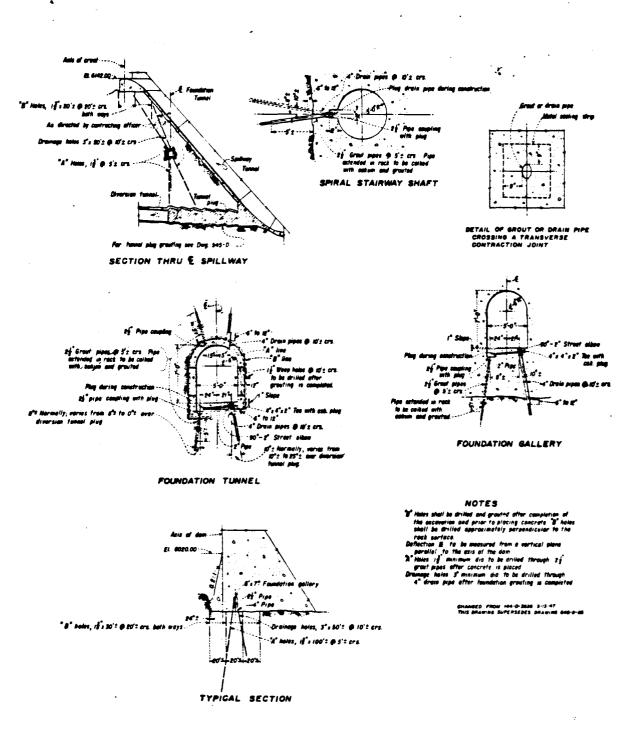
Kortes Dam--Foundation grouting and drainage. (Sheet 1 of 2.) From drawing 545-D-95.
